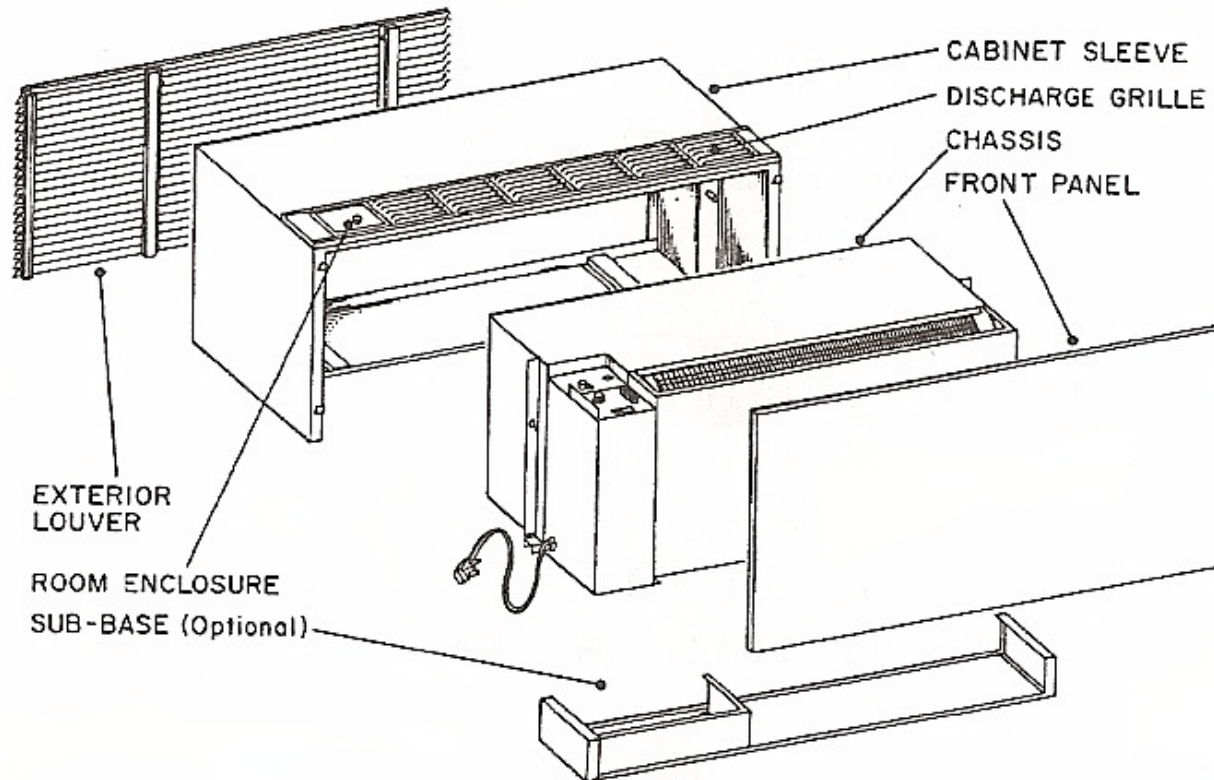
Packaged Terminal Air Conditioner with Combination Heating and Cooling Chassis
